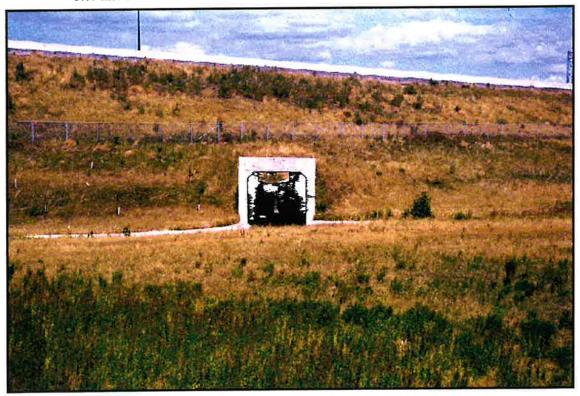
View of the downstream face of the culvert from the Upper Freeman Pond
